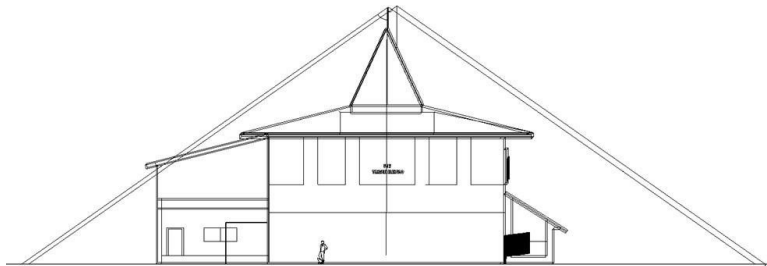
Protection angle of Building B12 Electrical Engineering FT UM (side view)
